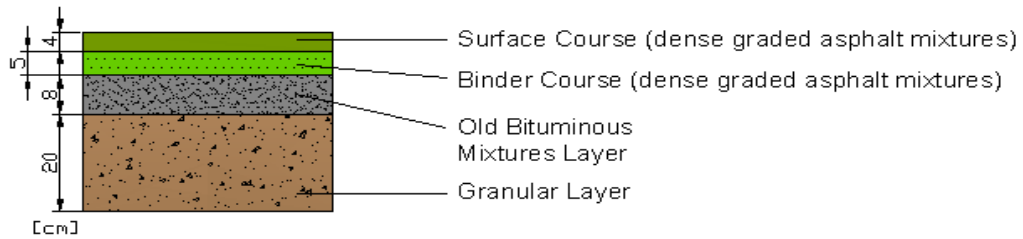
Pavement structure for solution A (km 38+000 to km 40+000)
